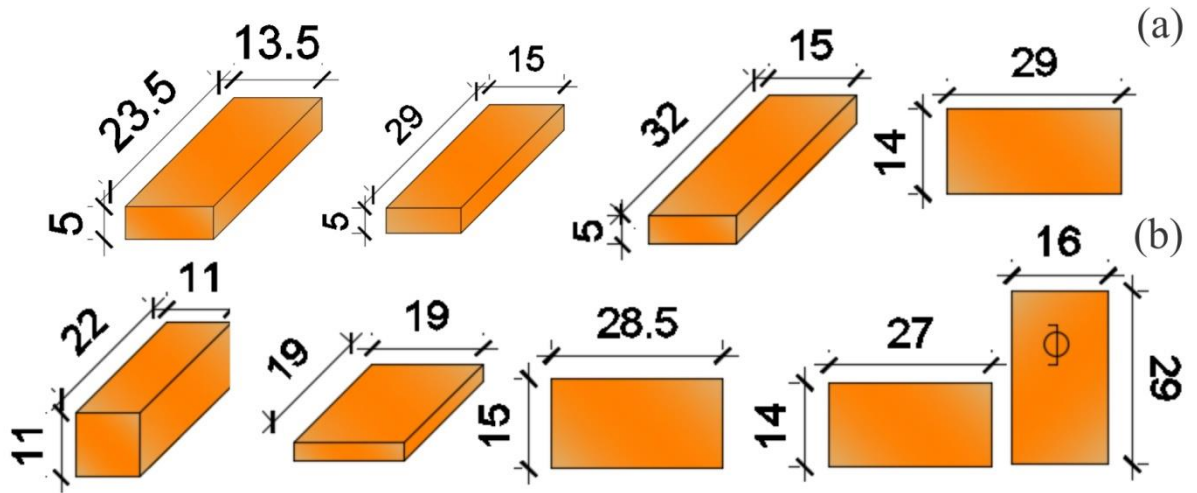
Examples of recurrent patterns of bricks of HCB (a) and RCB (b) applied in various functions in the FSJM: paving, masonry, ramps, walls (dimensions in cm).
